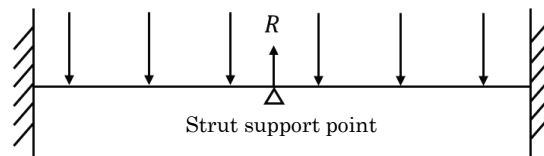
Load Conditions Between Girders and Struts (Equidistant Load Points)
